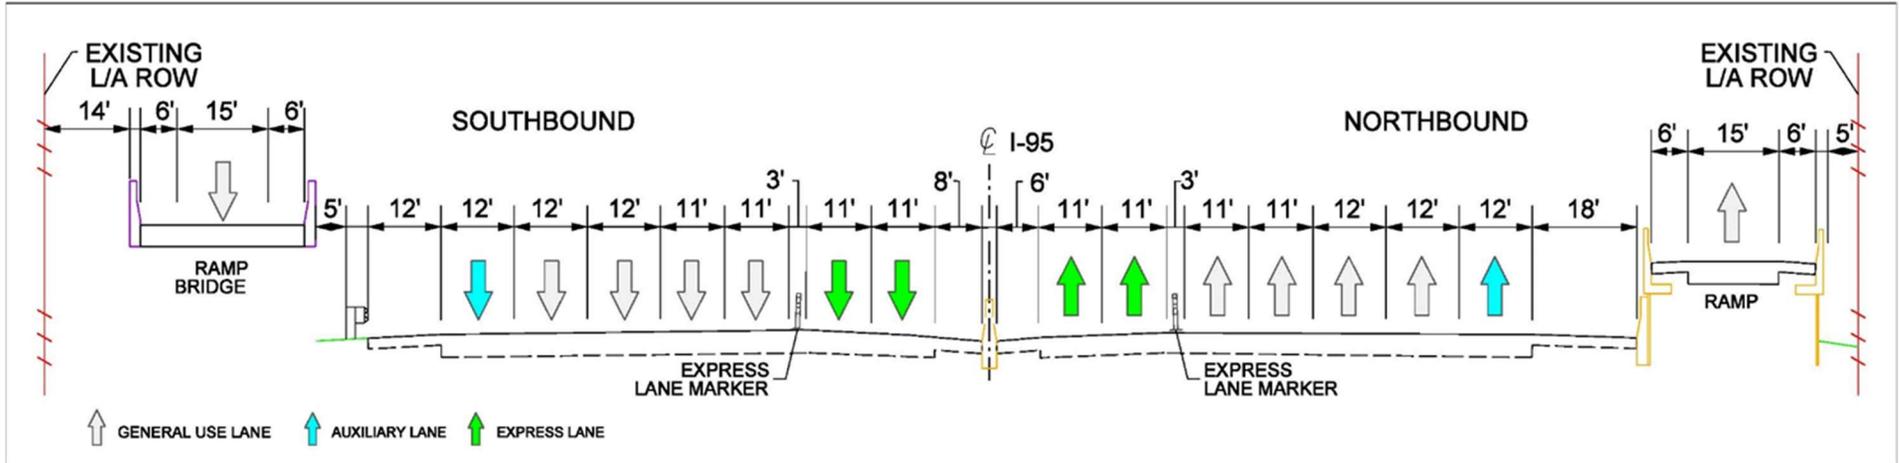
Alternative 1 North of Hallandale Beach Boulevard
